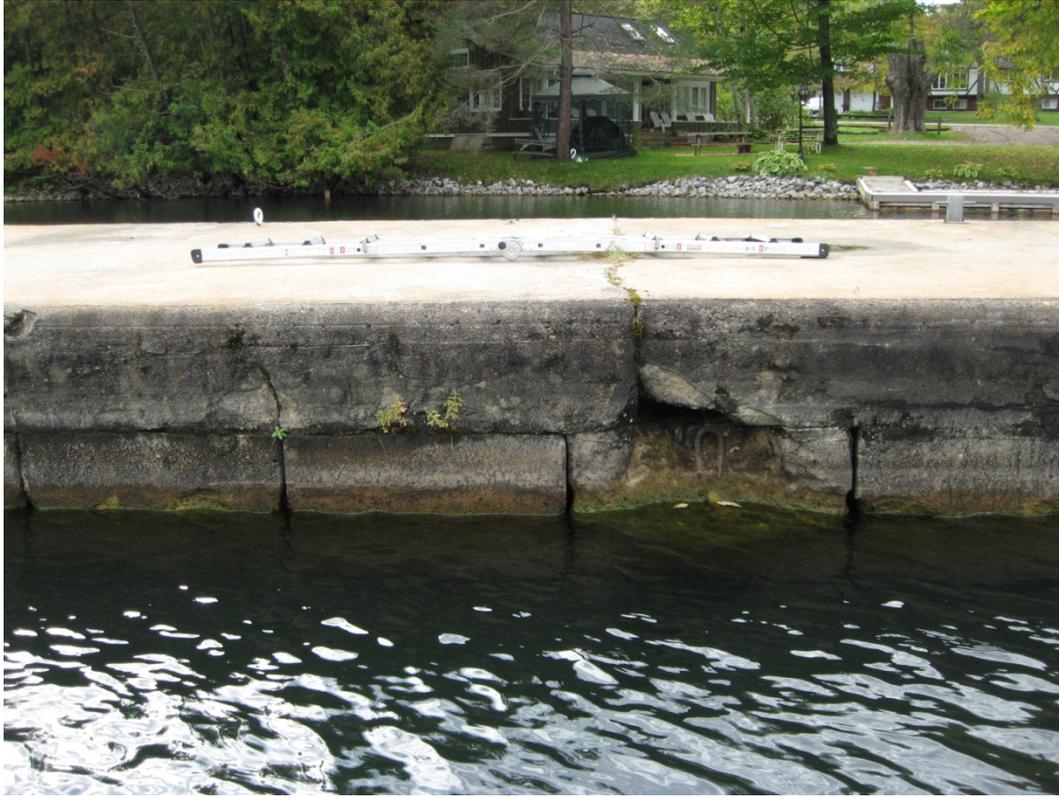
East side of the south section of the rest pier. Typical wide cracks and large spalled areas in the concrete cap and blocks.
